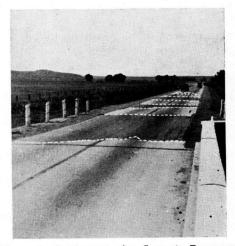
Settlement of a Concrete Pavement Slab Over a Low Fill
